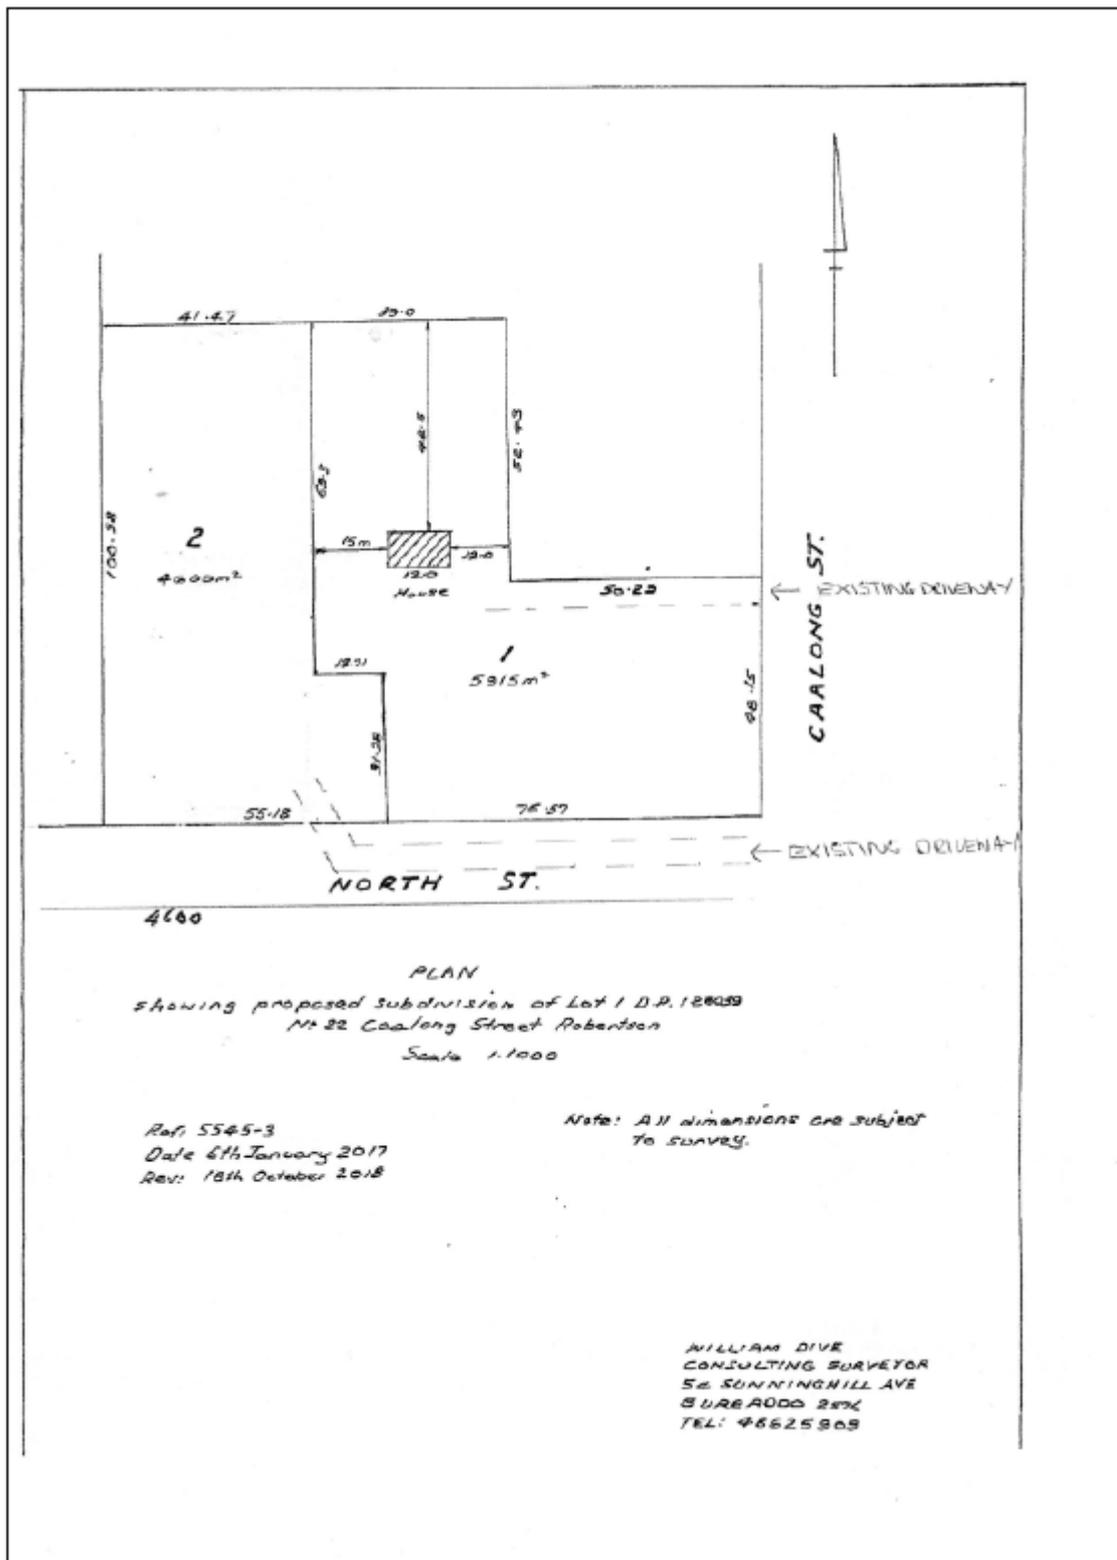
Proposed modified consent drawings (see also [Attachment 5](#))
